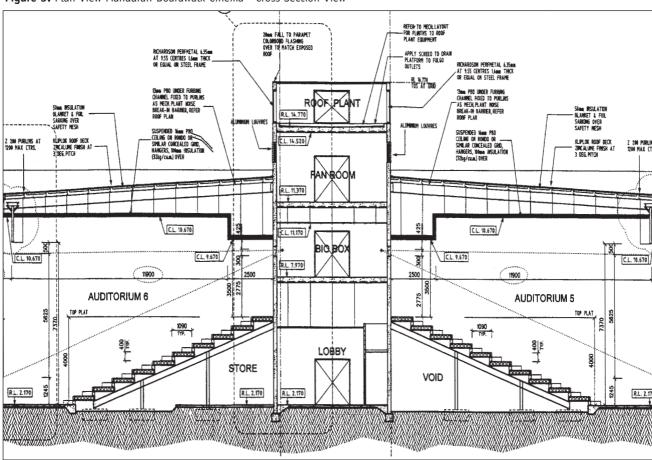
Plan View Mandurah Boardwalk Cinema - Cross Section View
